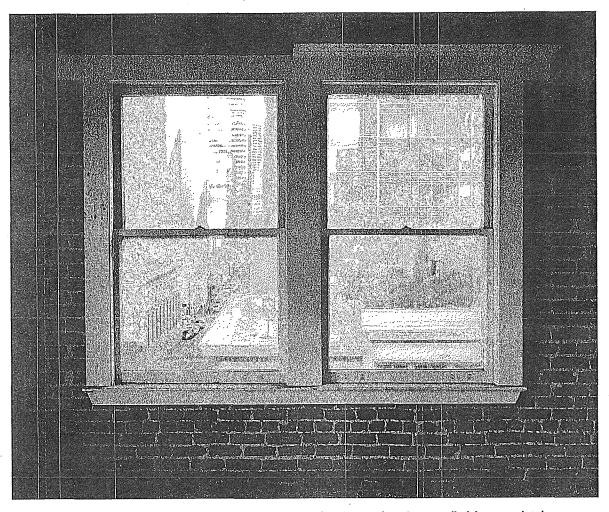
Detail photograph of typical double-hung windows at north and east walls (photograph taken on 02/27/2018).
